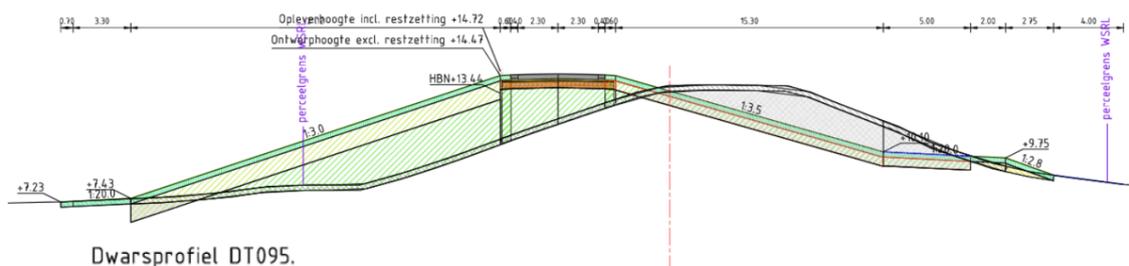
Technical cross-section of dike design DT095 of the Neder-Betuwe project. [Waterschap Rivierenland and Royal HaskoningDHV, 2022]
